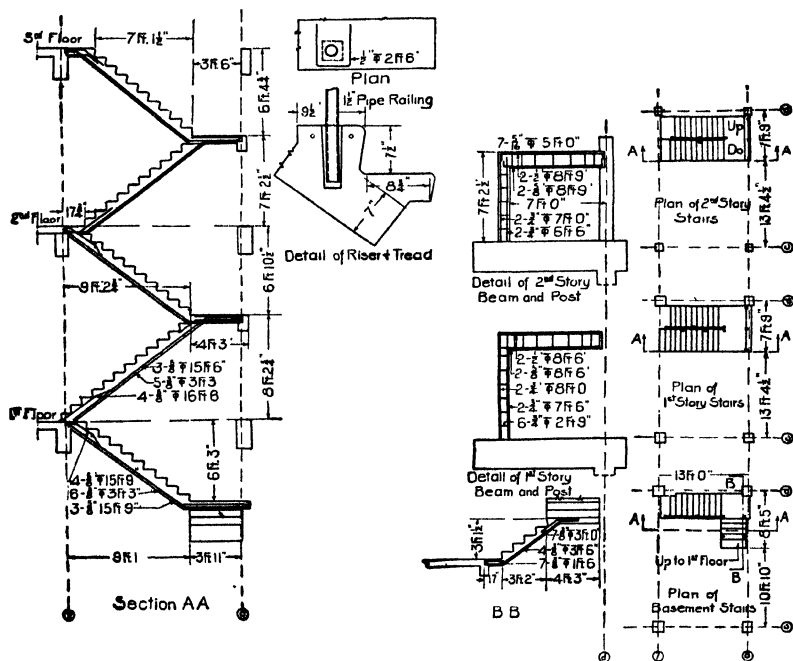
Details of Concrete Stairs Designed as Inclined Slabs. (See p. 639.)
